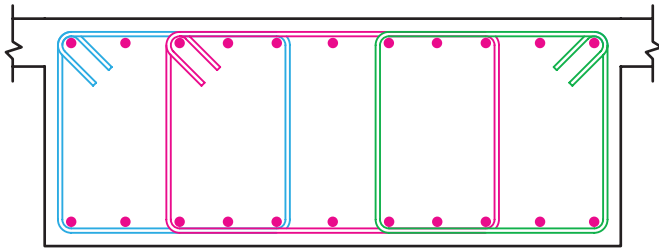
Beam stirrup configuration with three closed stirrups distributed across the beam width
